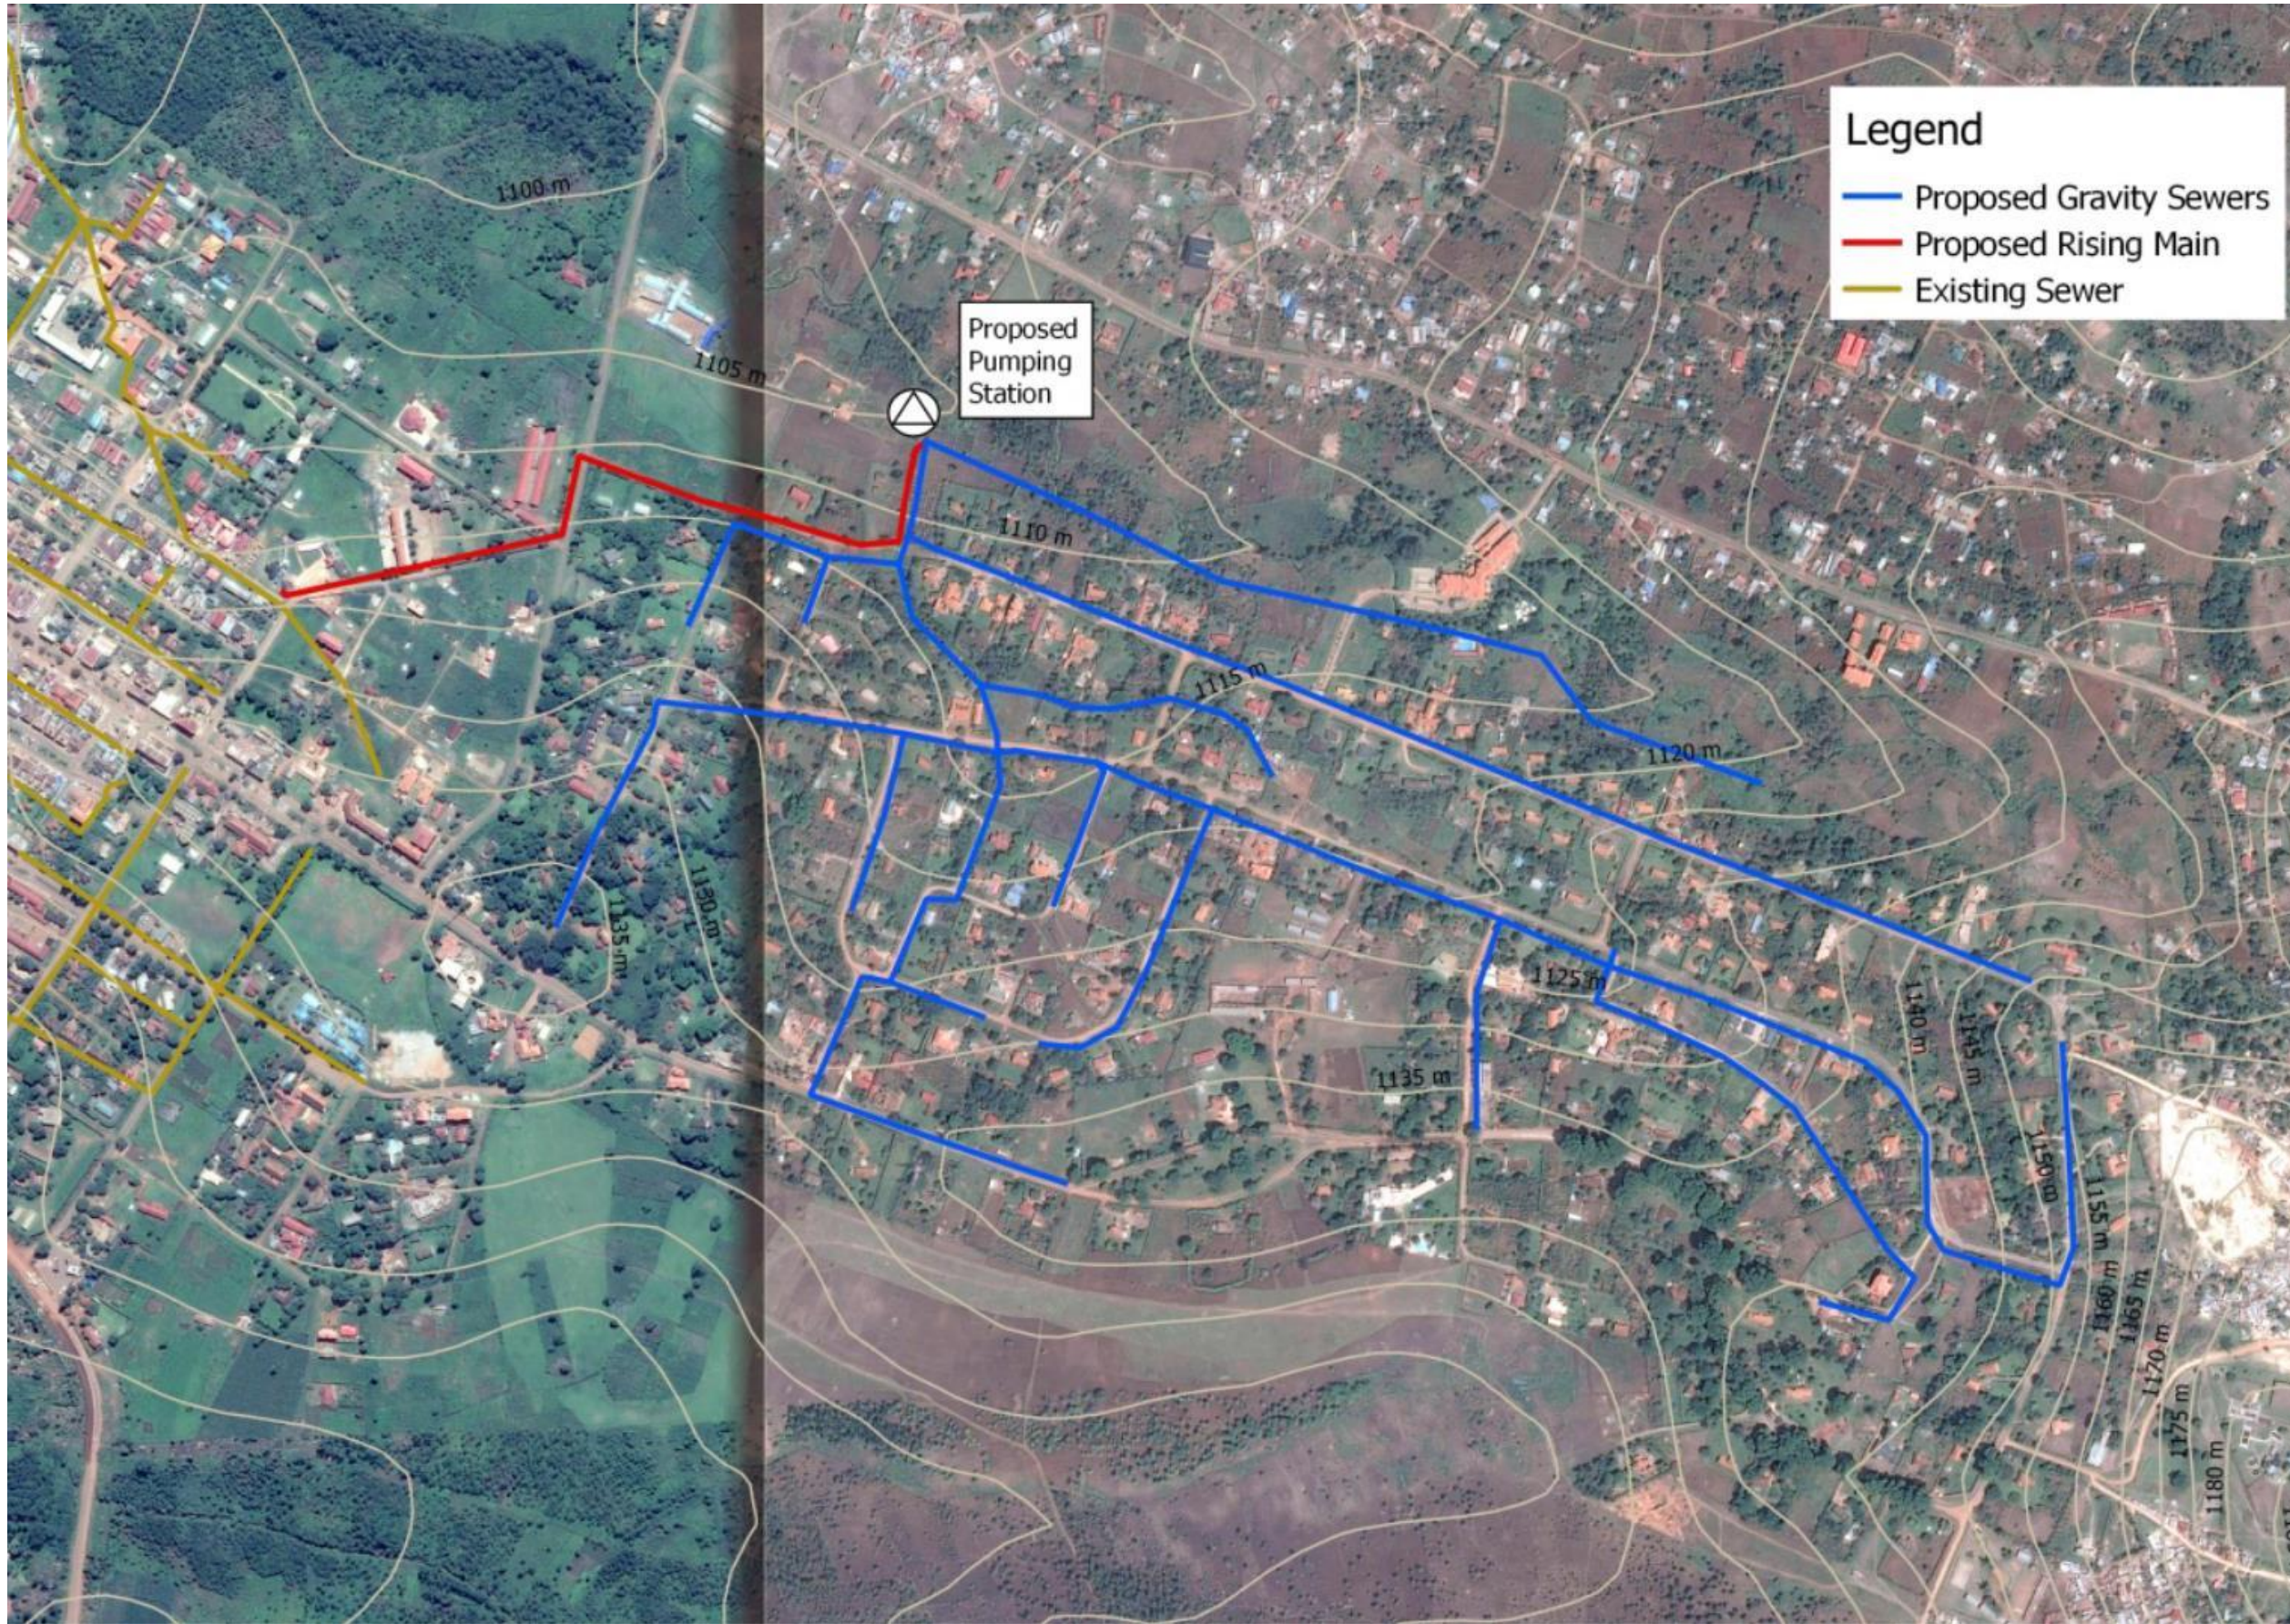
Proposed layout of the sewerage network for the Senior Quarters
